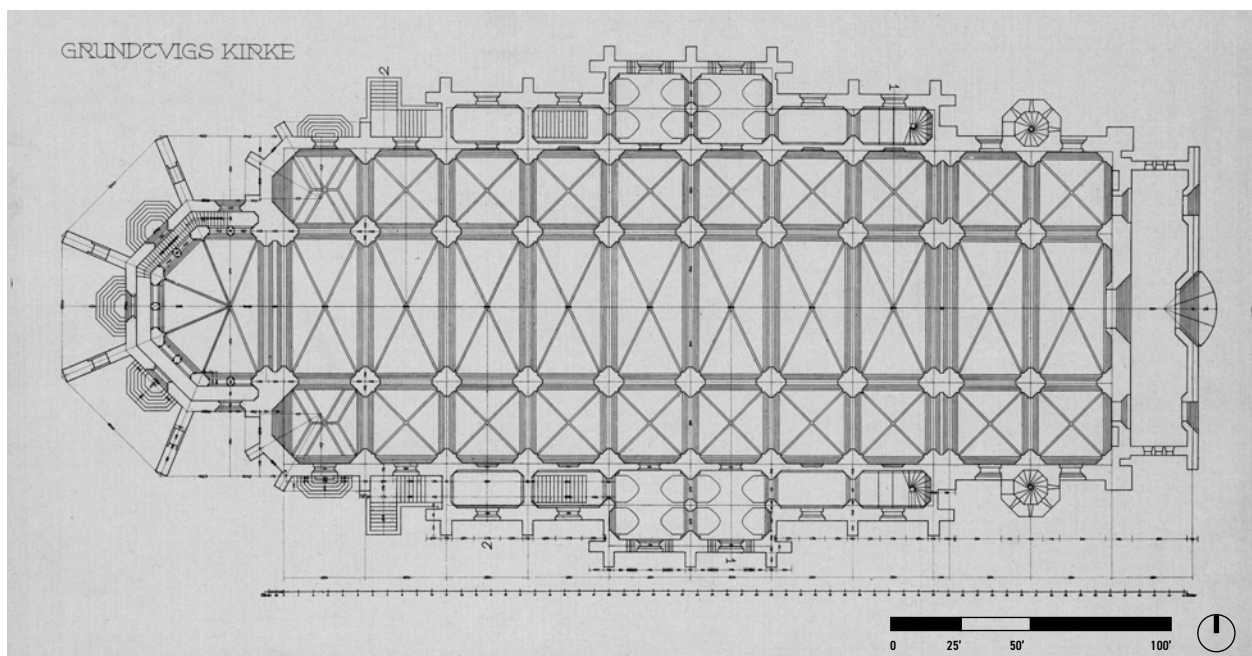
P.V. Jensen-Klint, plan of church, Grundtvig's Church, Copenhagen, 1940.
